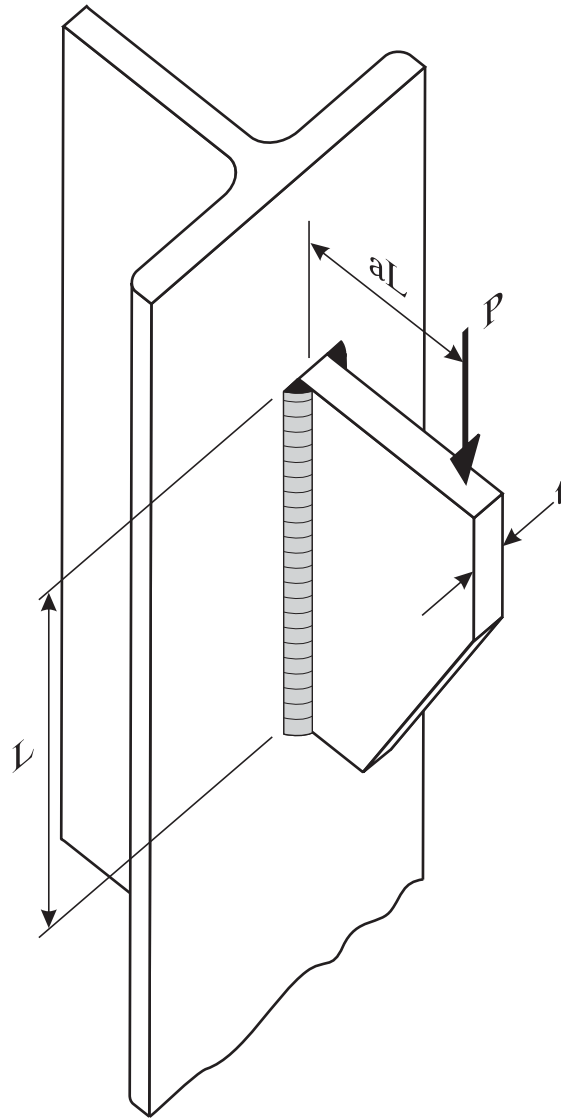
Fillet weld connection loaded eccentrically out-of-plane
